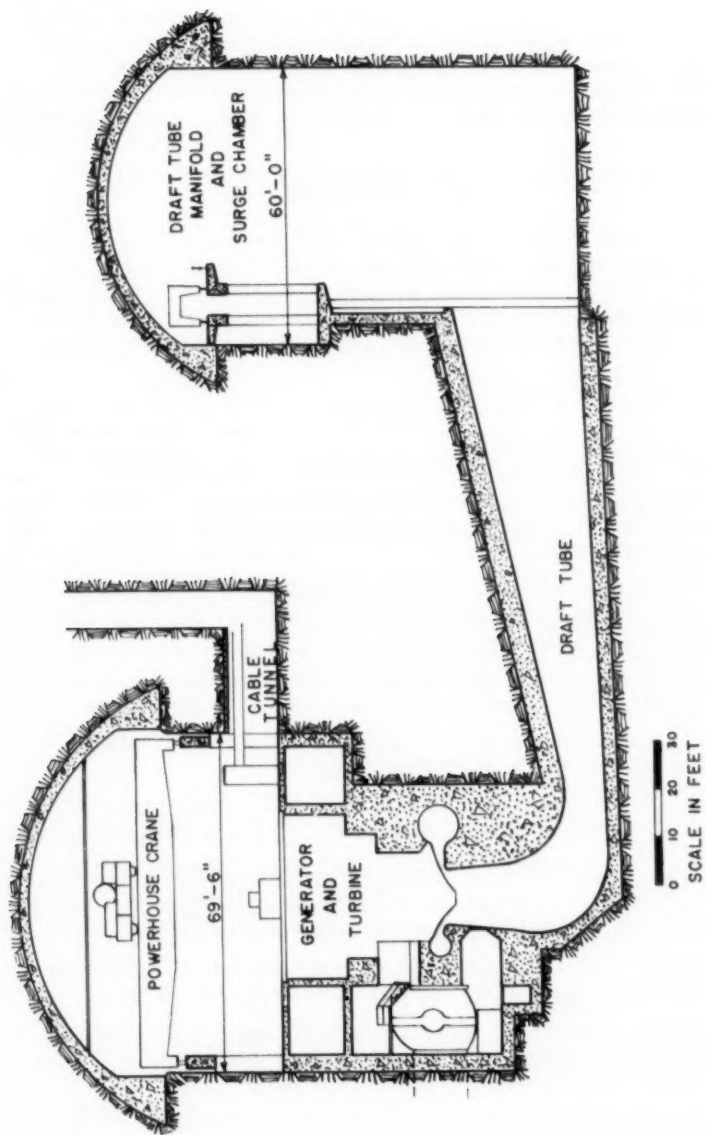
FIG. II CROSS SECTION OF CHUTE-DES-PASSES POWERHOUSE AND DRAFT TUBE MANIFOLD
